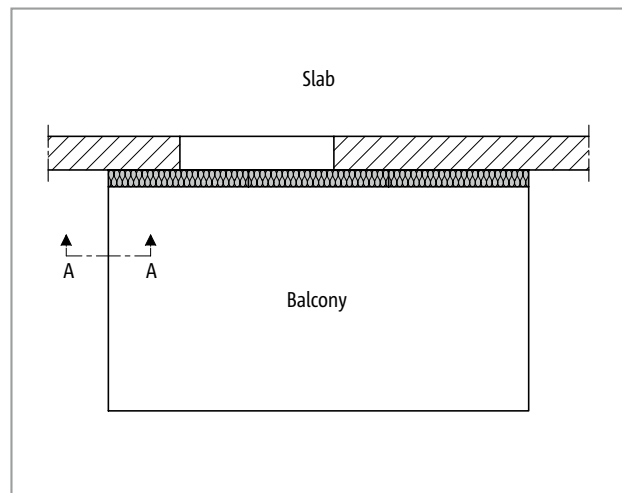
Schöck Isokorb® XT type K: Representation of the position of the cross-section A-A
